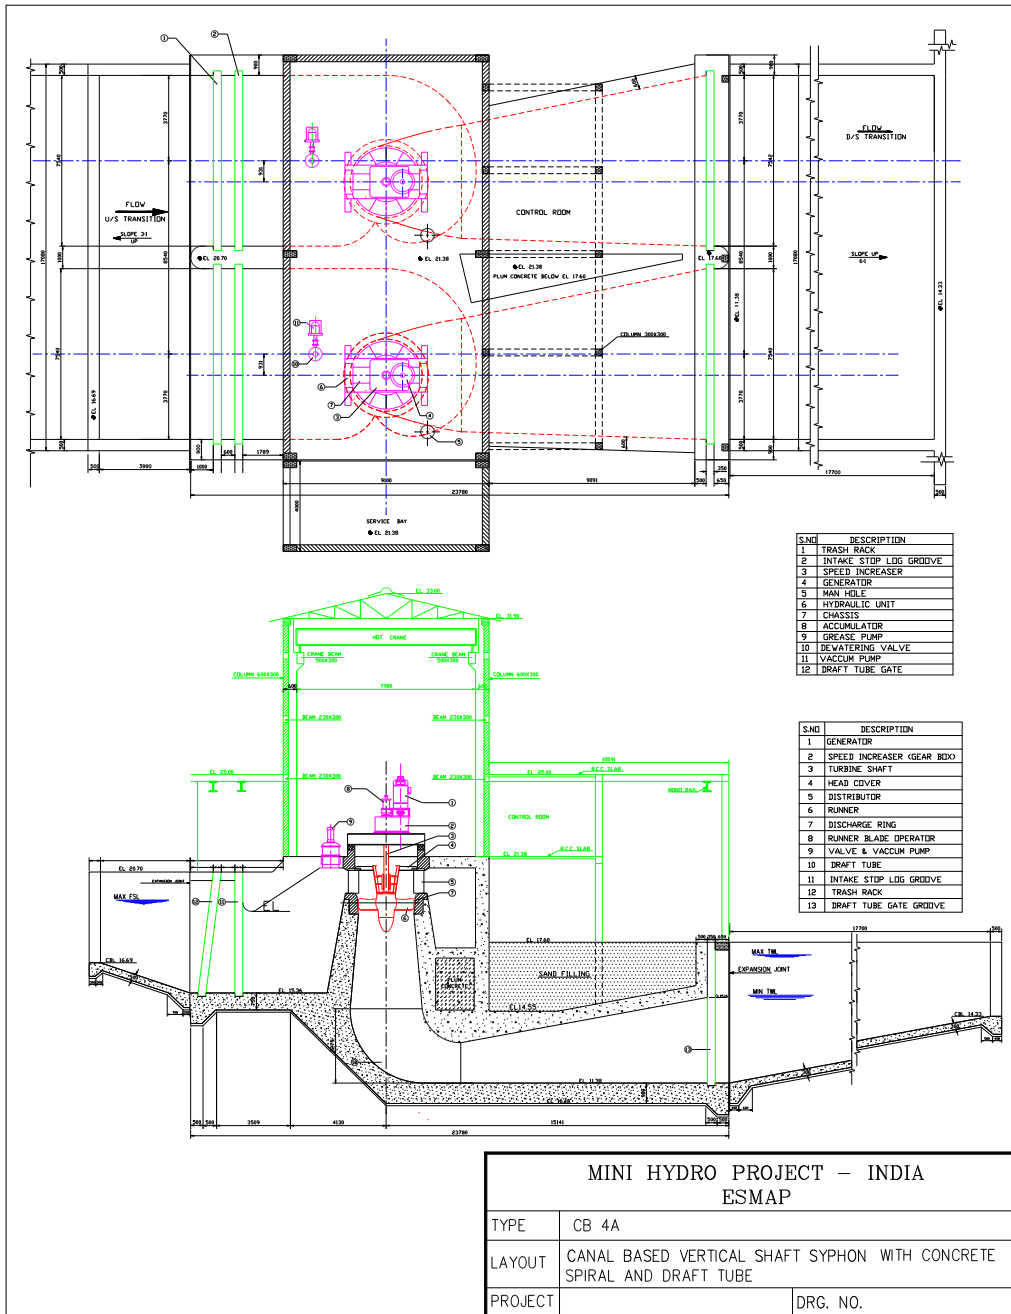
Plan and Profile of Siphon Turbine with Concrete Spiral
